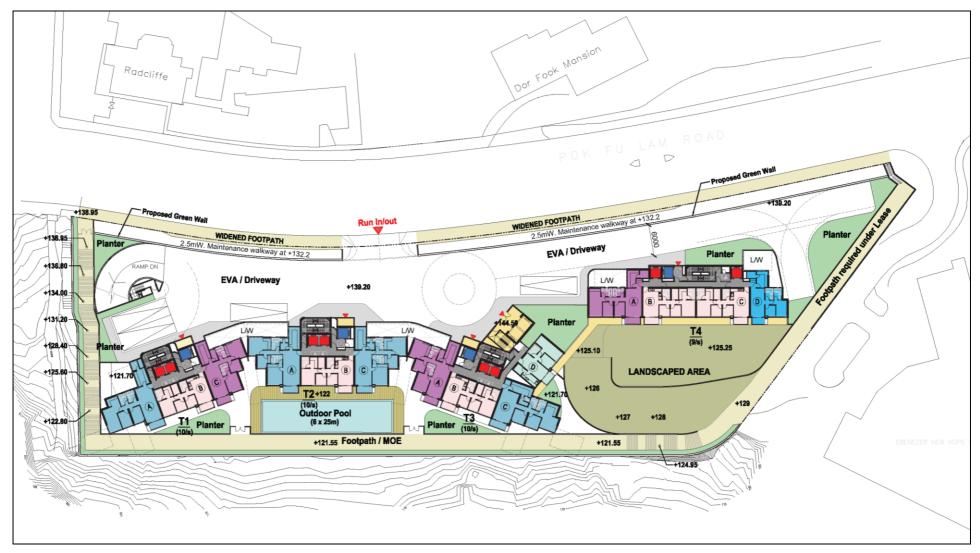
Master Layout Plan of the Proposed Residential Development (UG/F level)
